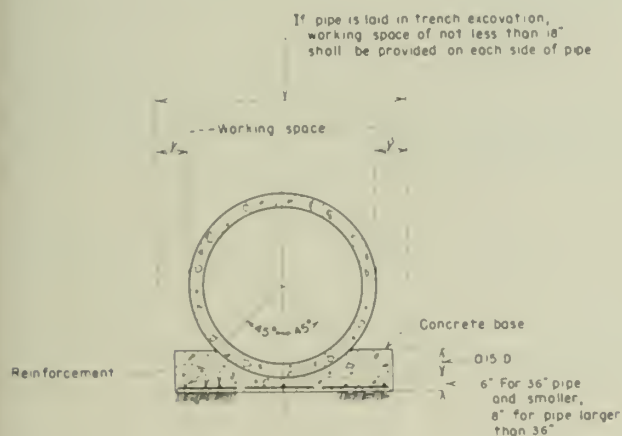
Precast concrete pipe on concrete base for conduit under or through earthfill dams.
